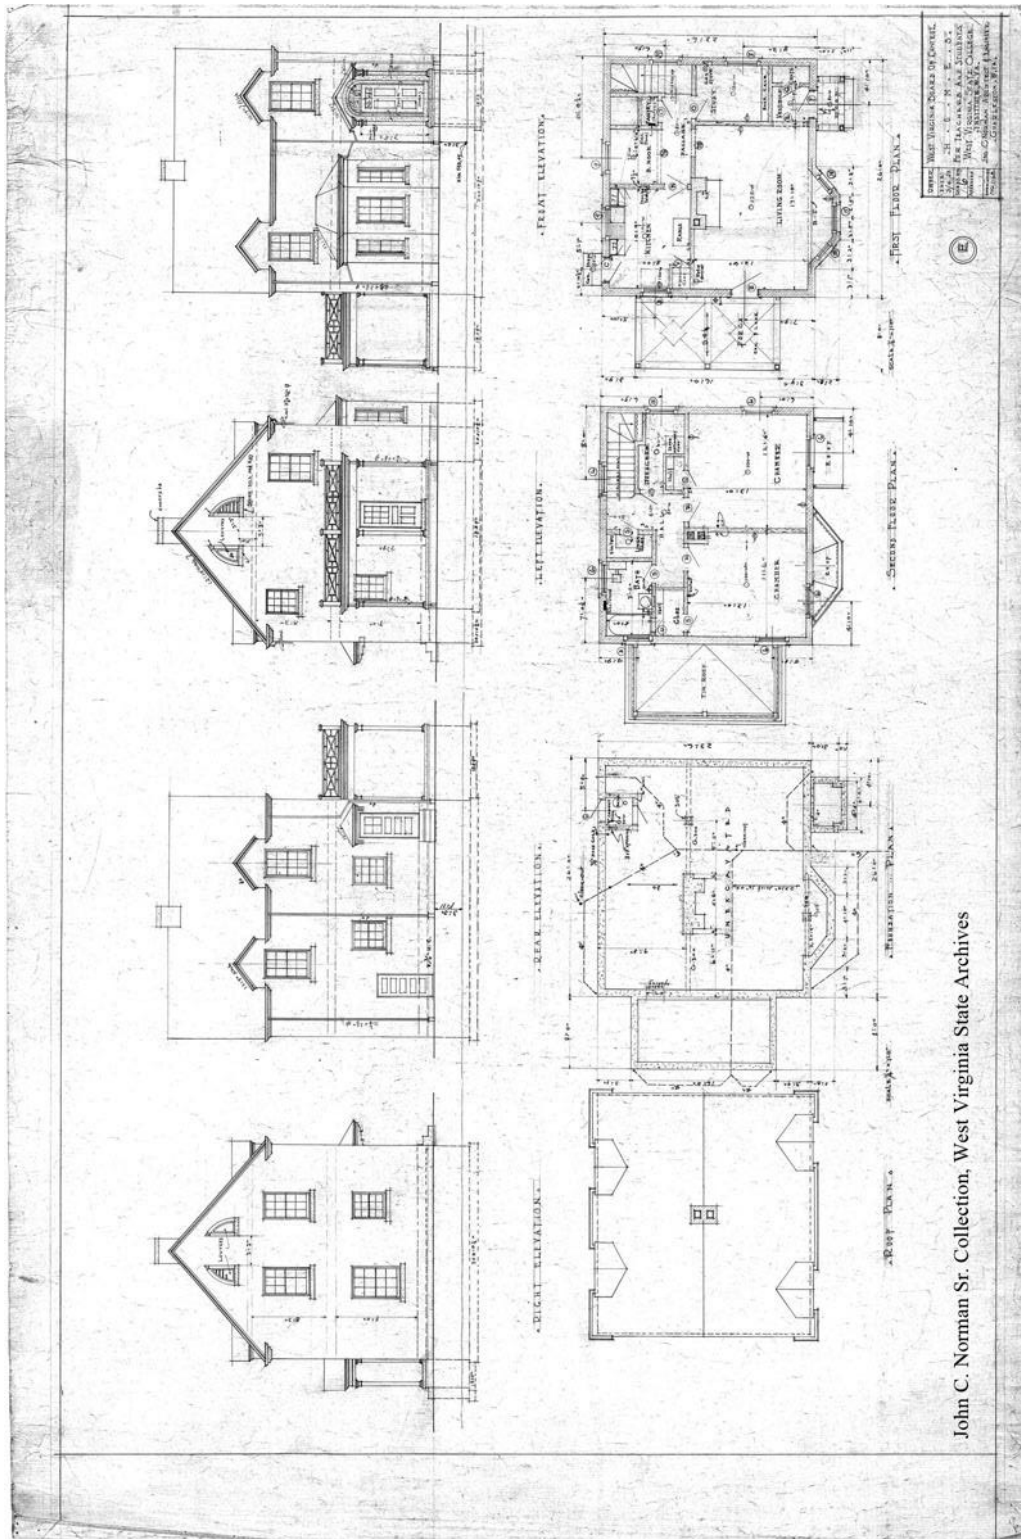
Faculty House E Floor Plan, Courtesy of the West Virginia State Archives, John C. Norman Sr. Collection
